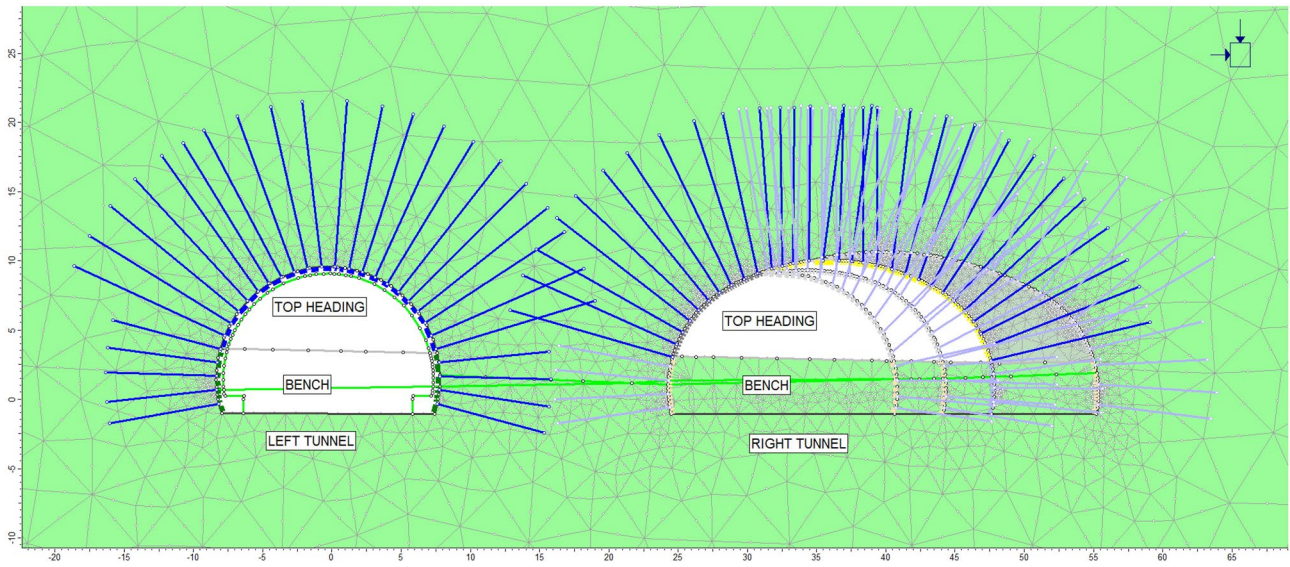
Expansion section of right tunnel; stage 12, installation of tunnel support systems
